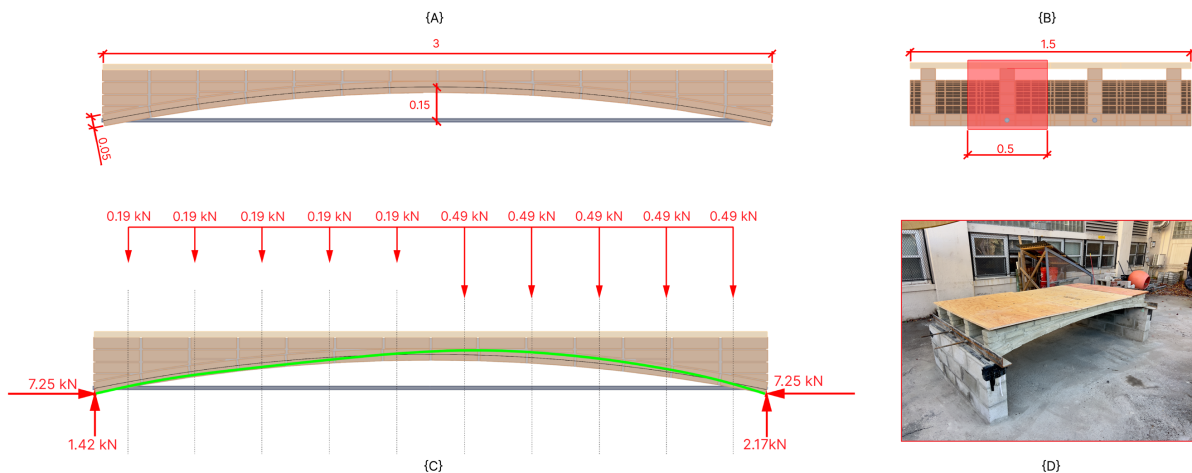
Building dimensions (m) and loading details of 3m vault prototype.
